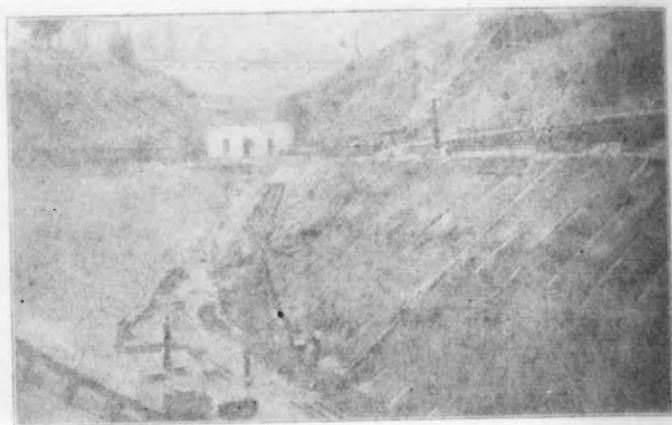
WEST SLOPE, RESERVOIR NO. 4, SHOWING UNDER-DRAINS, SEPTEMBER 21ST, 1901.
